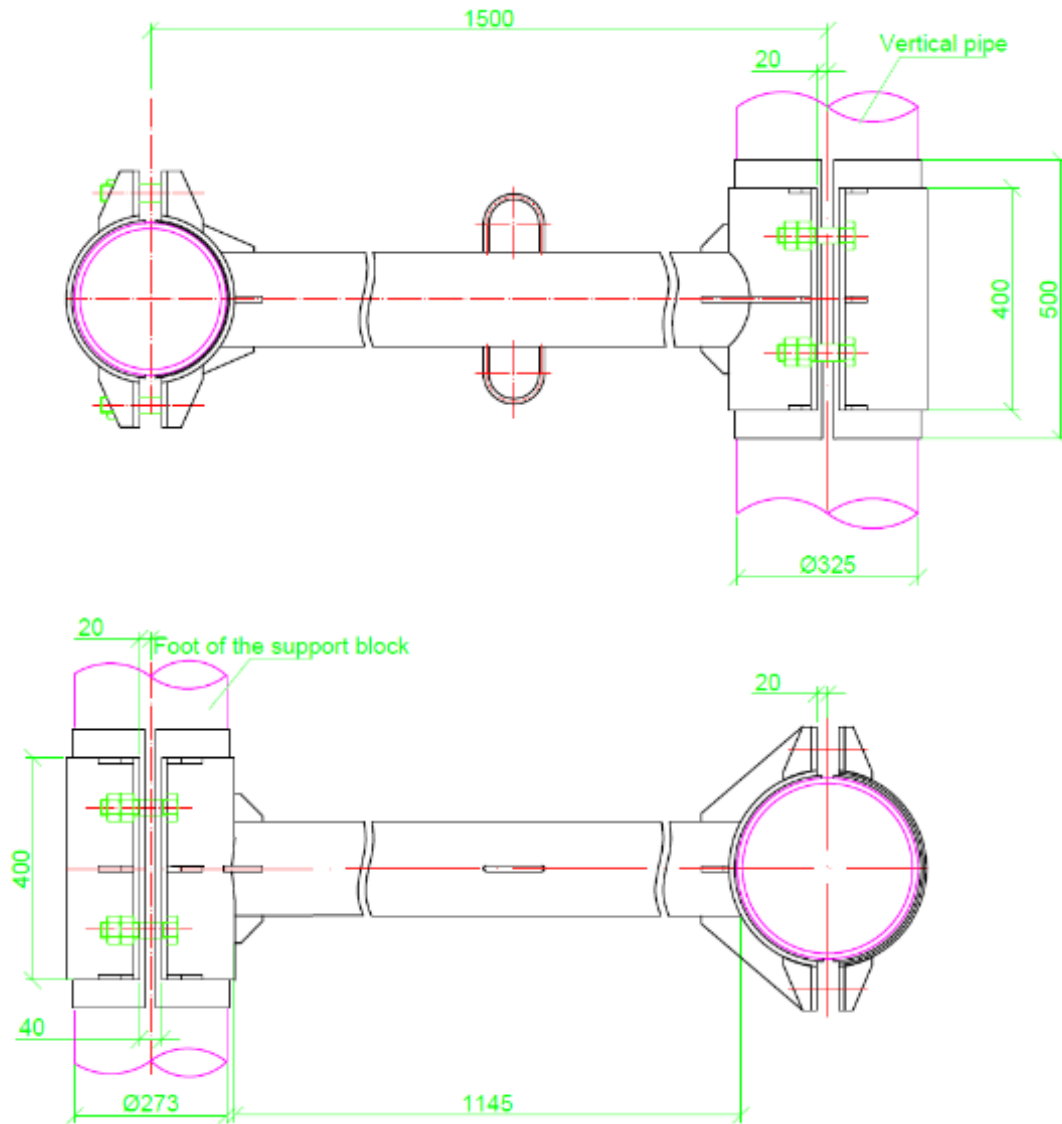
Installation, routing, and fastening of the vertical pipe from the seabed to the topside structure of the trestle-connected platform deck
